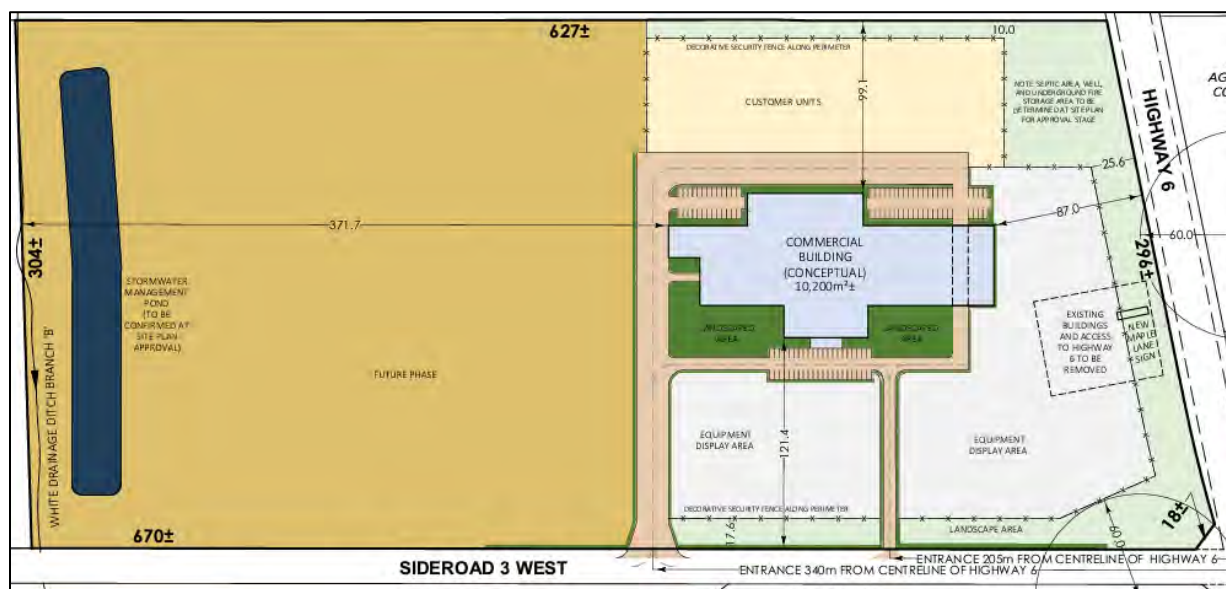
Site Plan submitted by Van Harten Surveying Inc., December 2023
